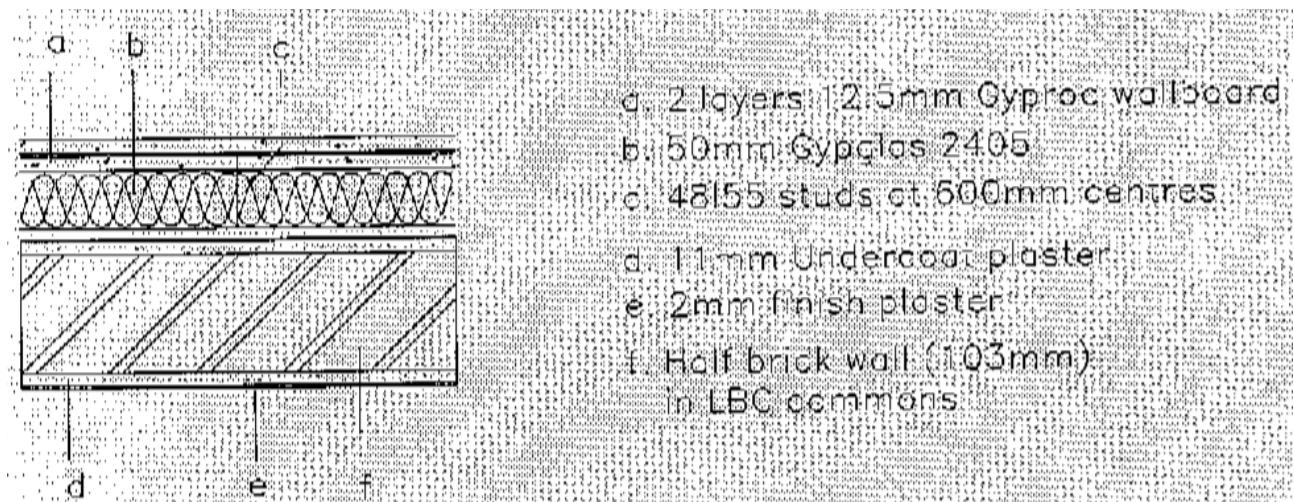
Wall with similar construction of the proposed brickwork external wall.
